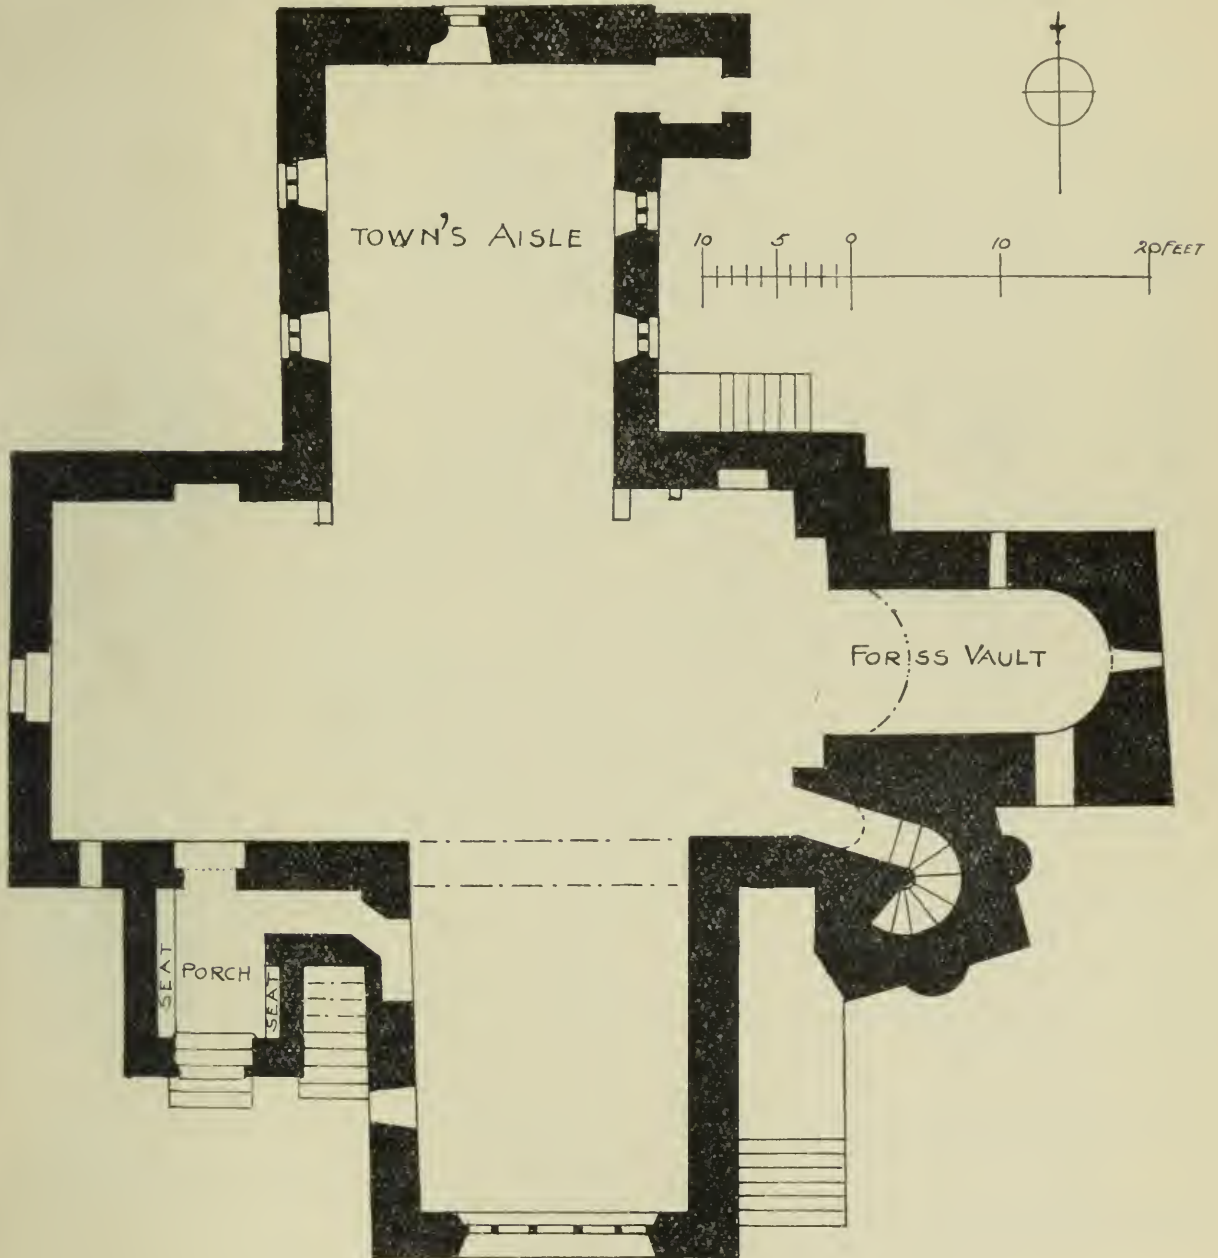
St Peter's Church, Thurso (No. 418); Ground-plan.
